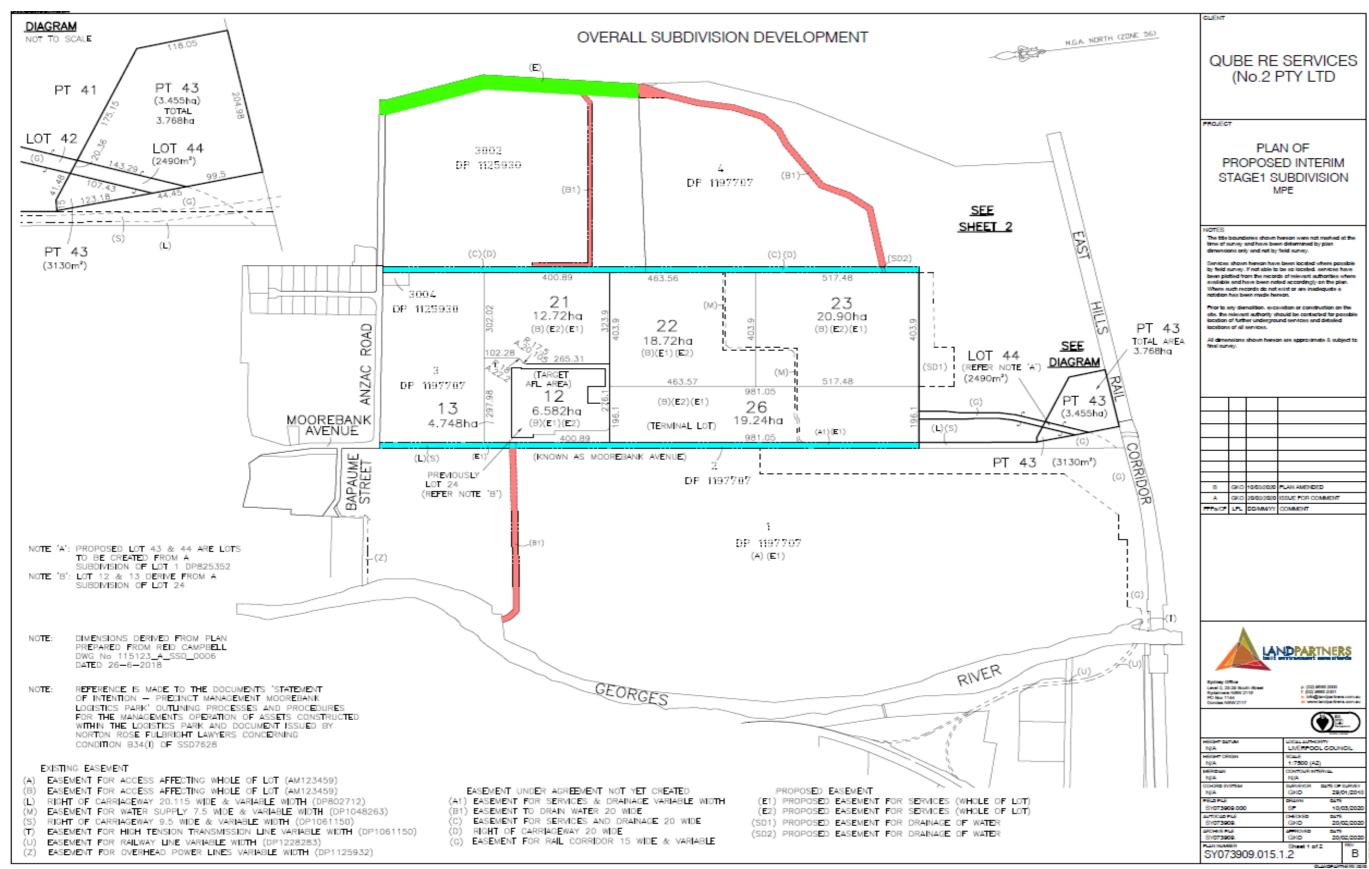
| Proposed Overall Subdivision Plan (Source: Applicant's Modification Report)
